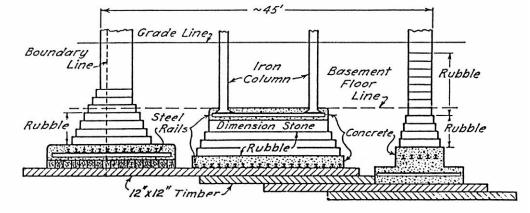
SECTION THROUGH COMBINED FOOTINGS OF AUDITORIUM
